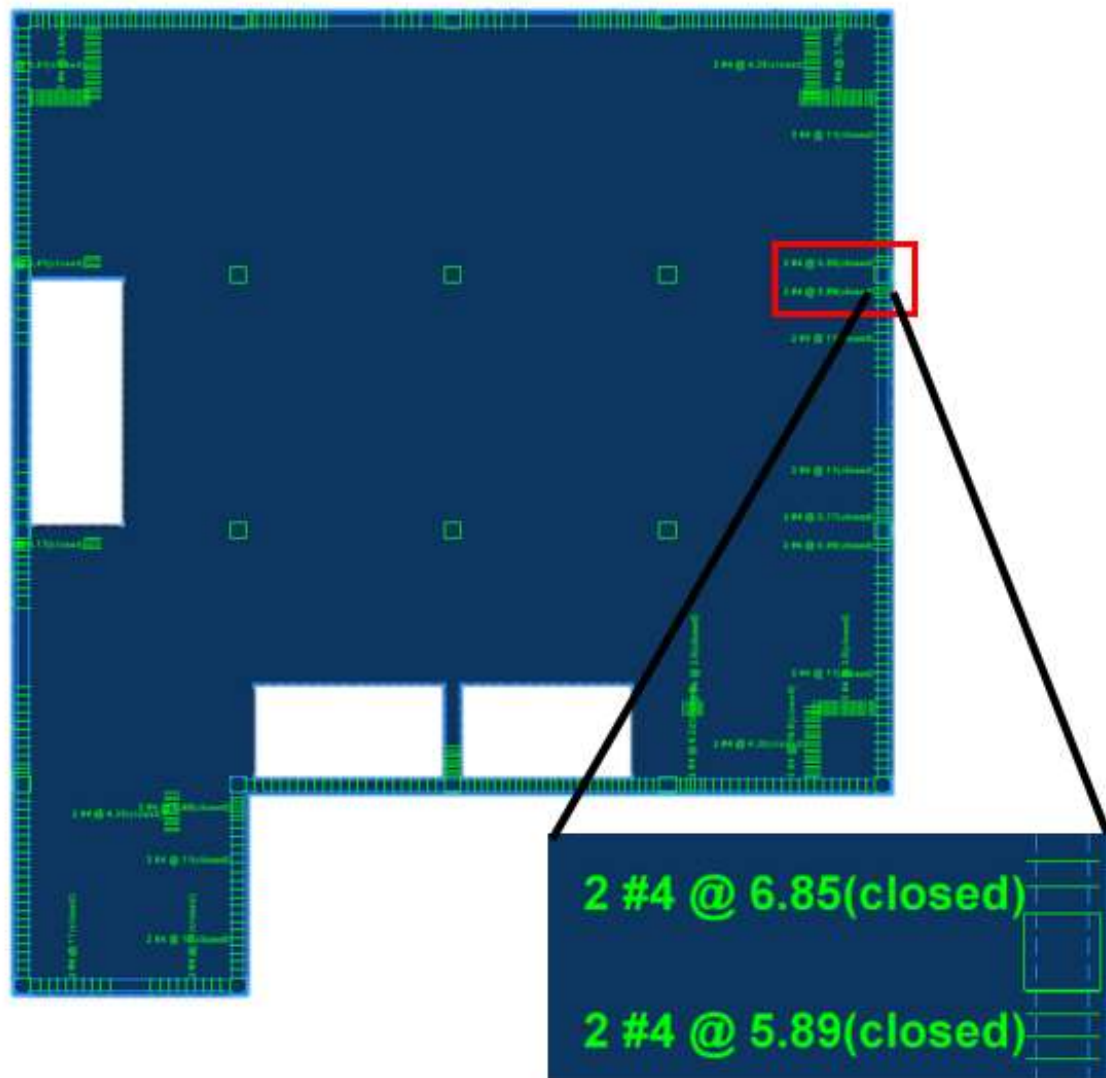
RAM Concept Shear Reinforcement Plan (RAM Concept)
